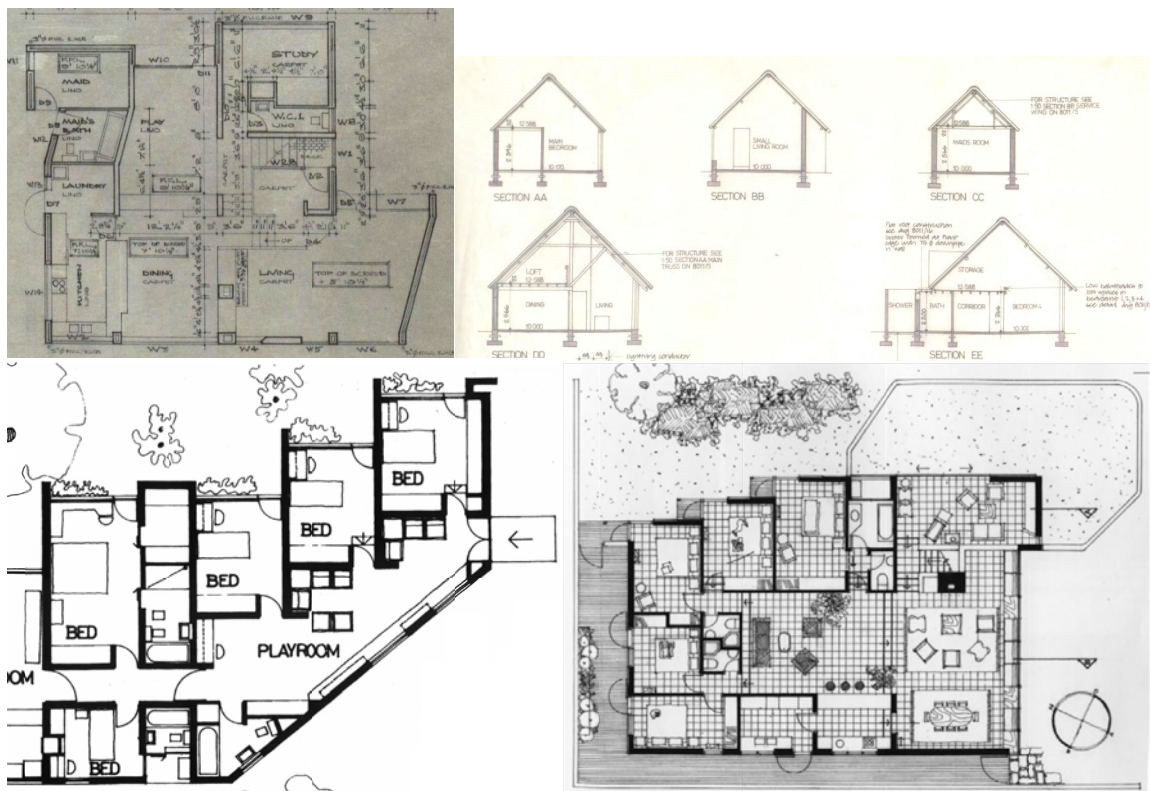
Top left: Fagan's sketch plan for House Levin (1969) with central circulation core (Fagan archive - Job No. 6910, 24/07/1969). Top right: Various sections for House Swanepoel in Cape St. Francis (1980) showing loft and storage spaces (Fagan archive - Job No. 8011, 18/11/1980). Bottom left: Part plan of House Raynham showing extension of passageway into playroom (Fagan, 2005a:52). Bottom right: Plan of House Swanepoel in Hermanus showing tight service and generous living spaces (1990) (Fagan, 2005a:103).
